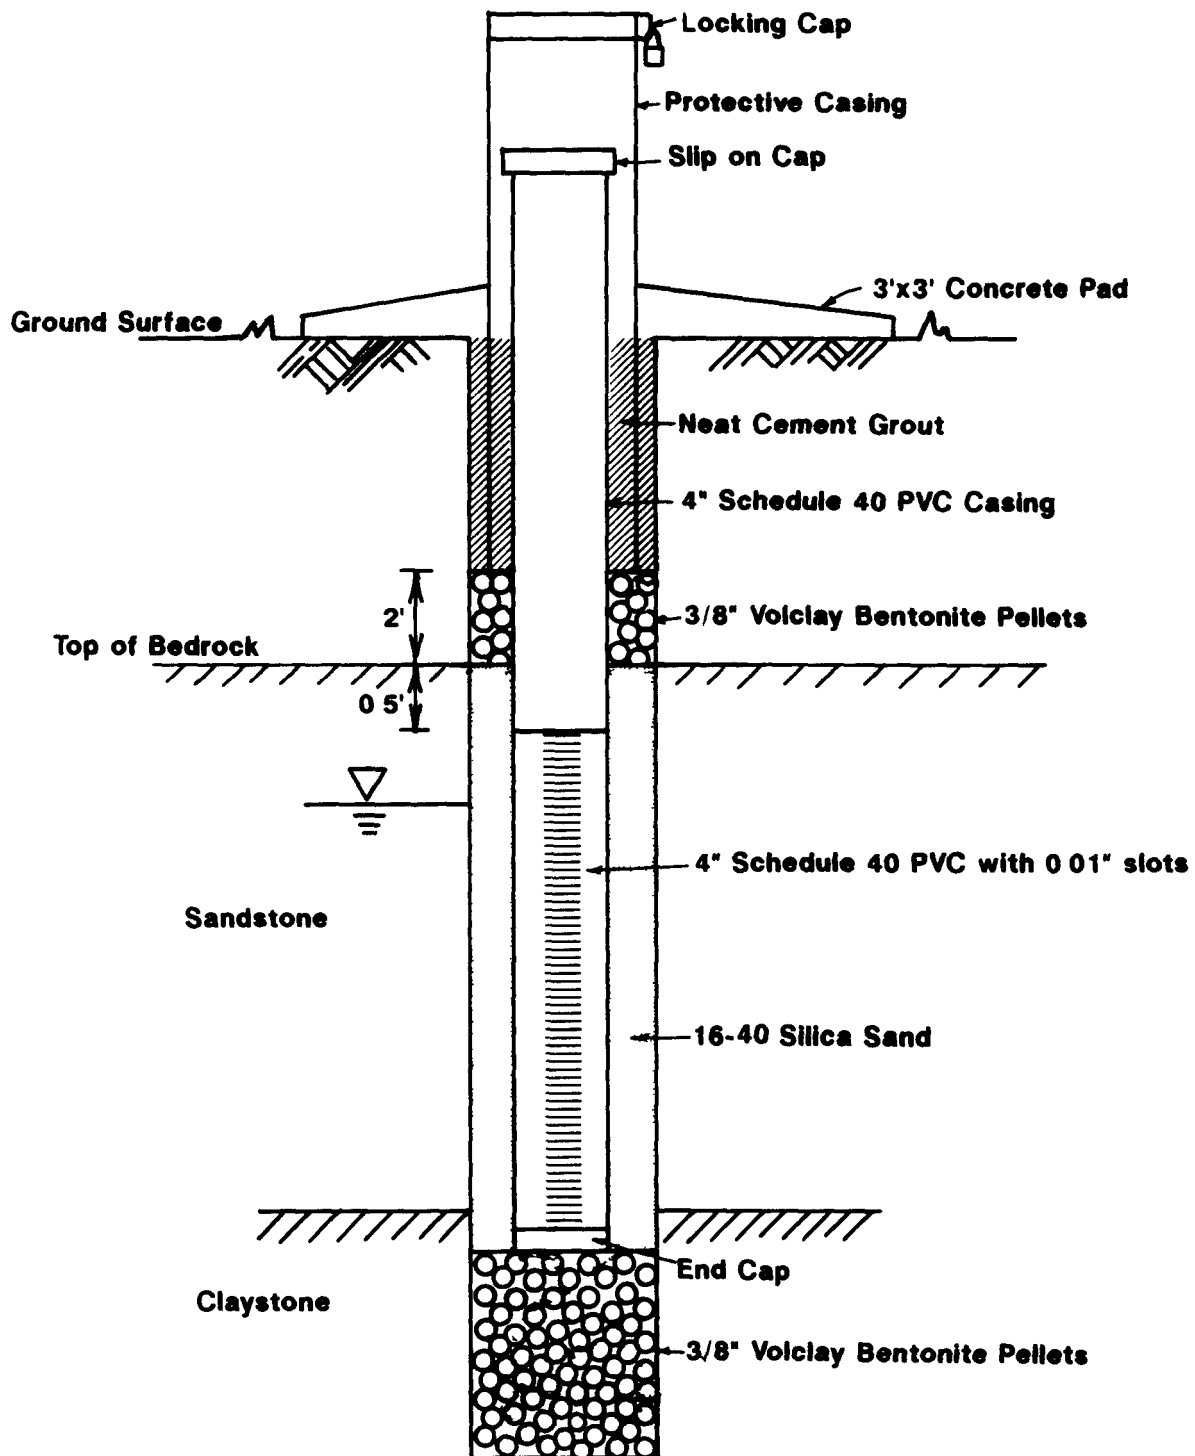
SHALLOW BEDROCK WELL CONSTRUCTION
